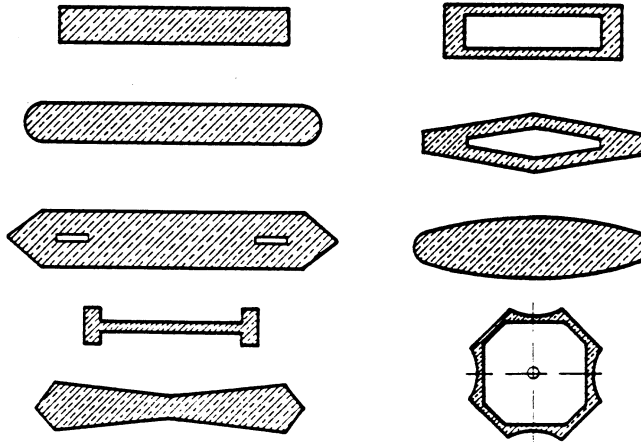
Typical cross-section shapes of piers for river and waterway crossings.
